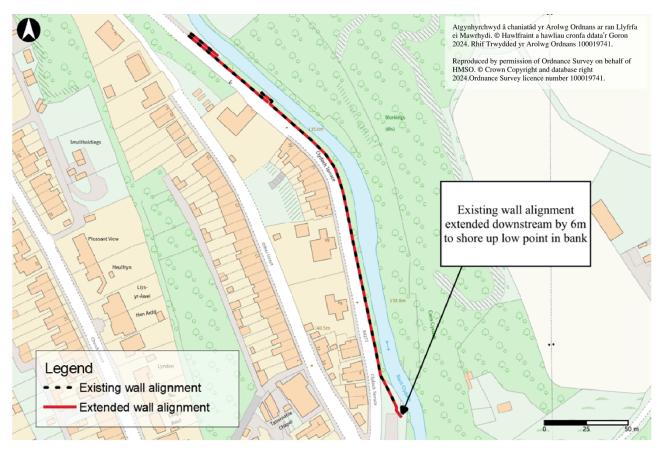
Extent of existing and wall proposed as part of Shortlist Options 1 and 2, which has been extended by approximately 6m downstream
